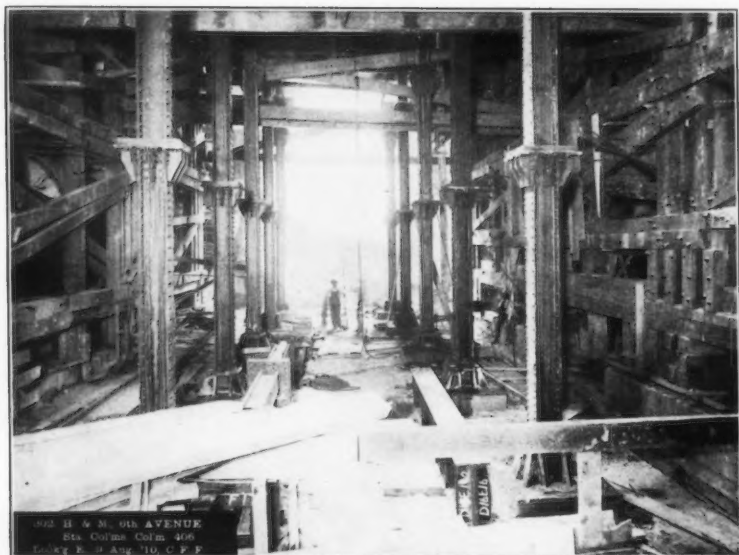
CLOSURE SECTION OF THIRTY-THIRD STREET STATION. STEEL COLUMNS SET UP.
